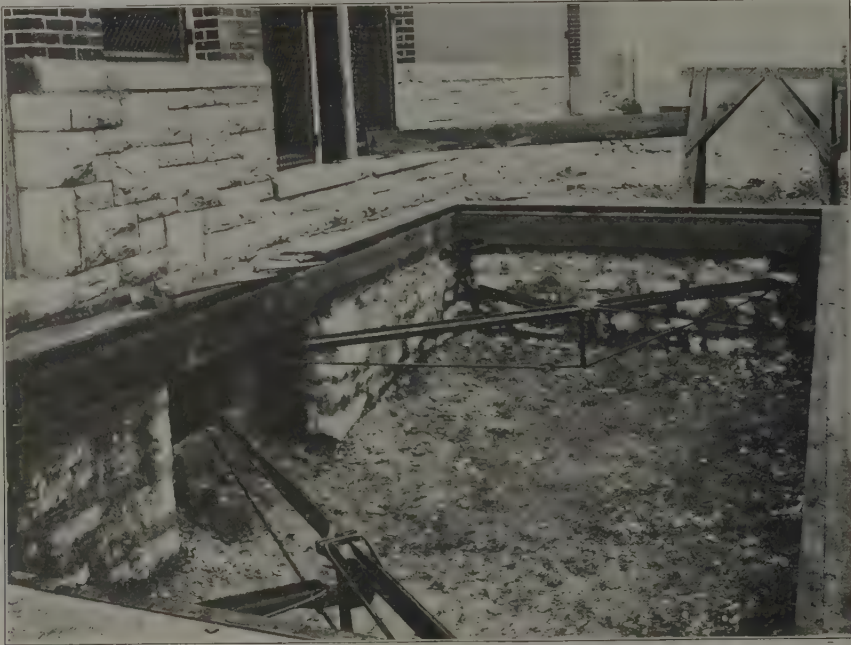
Rubble Stone Foundation for Wagon Scales.
